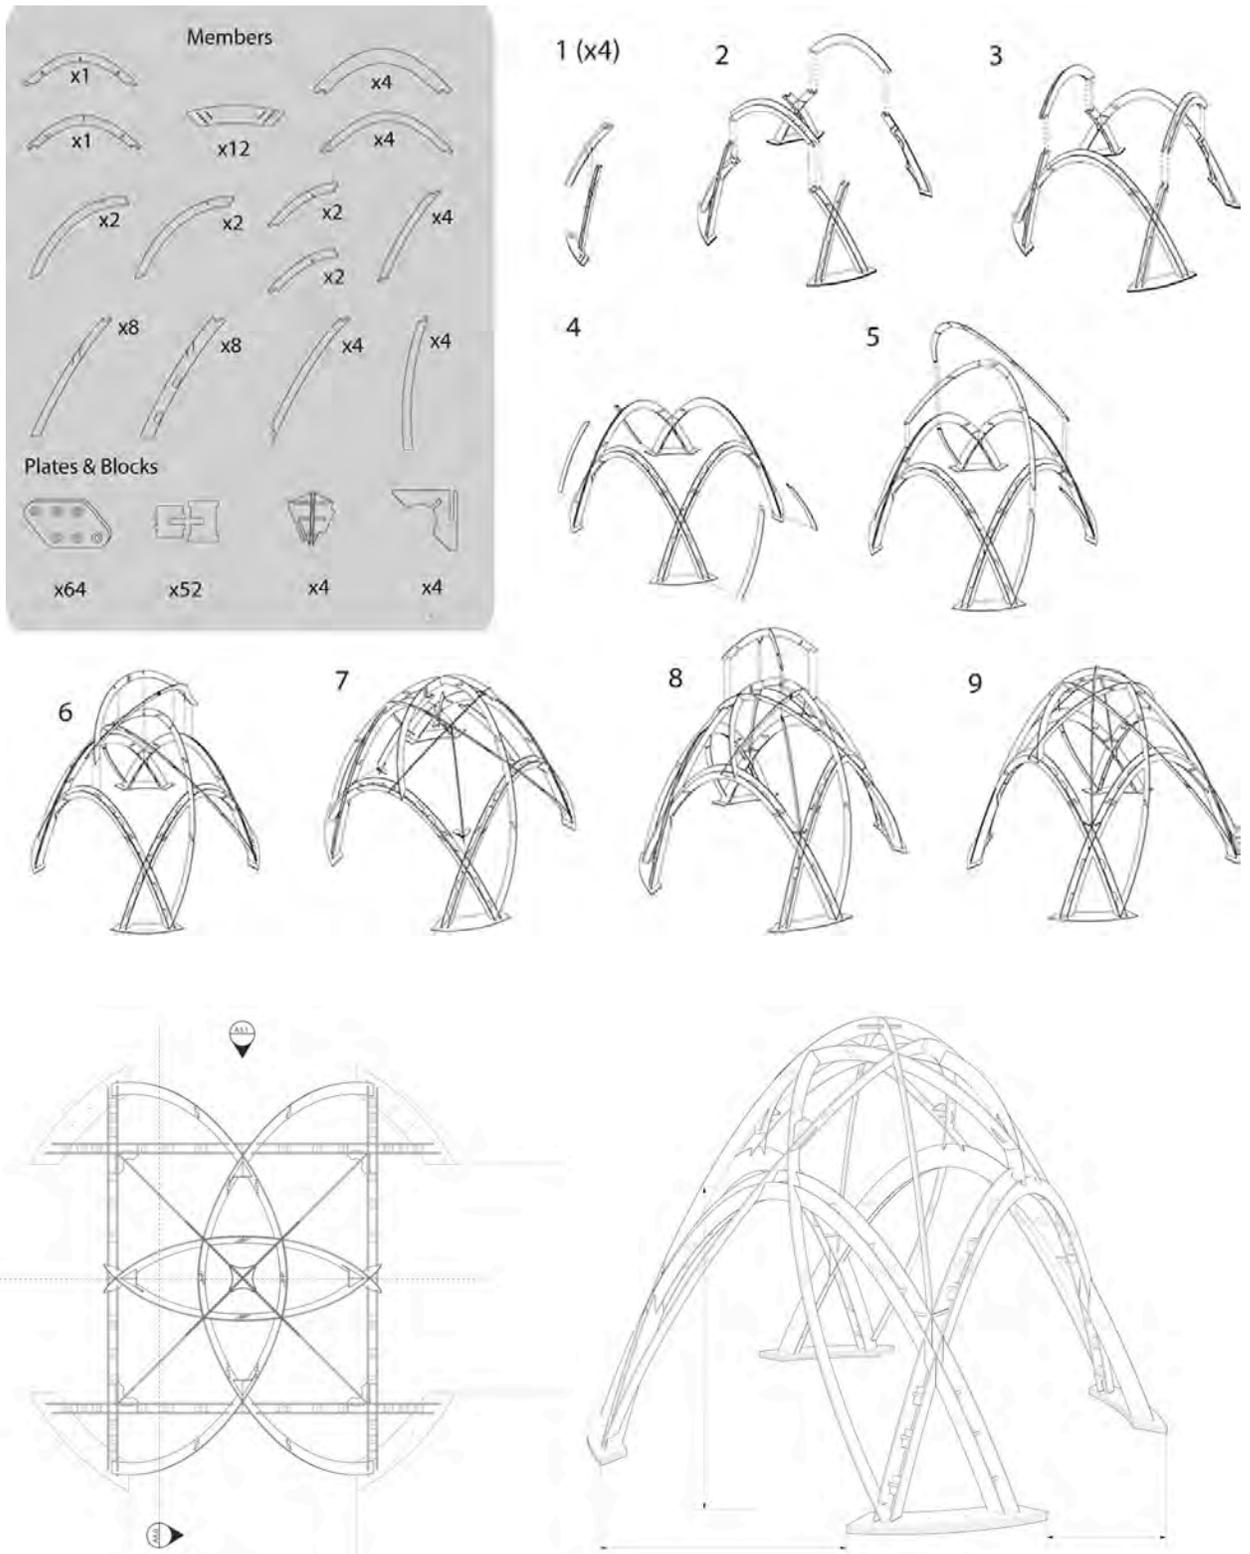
Assembly drawing to determine number of parts and construction sequence.
